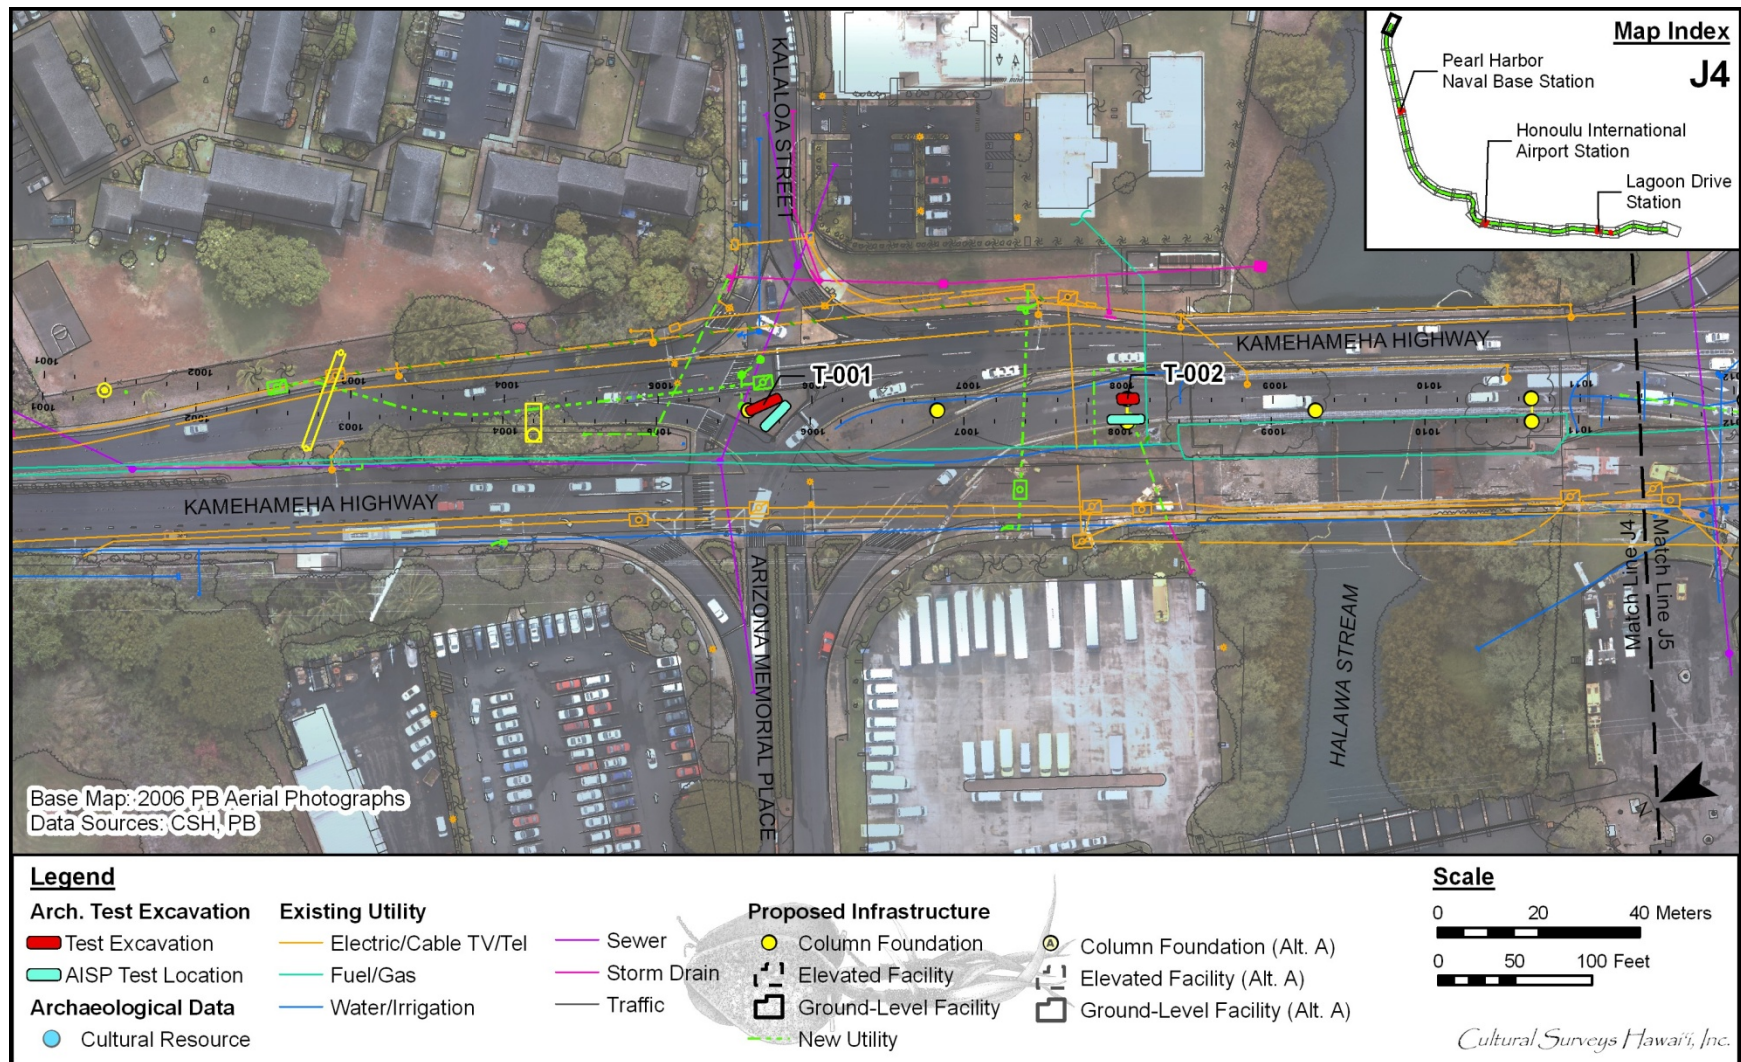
Map Sheet J4 (near Kalaloa Street), two test excavations (T-001, T-002) at column foundations @ 994+40 & 996+70
